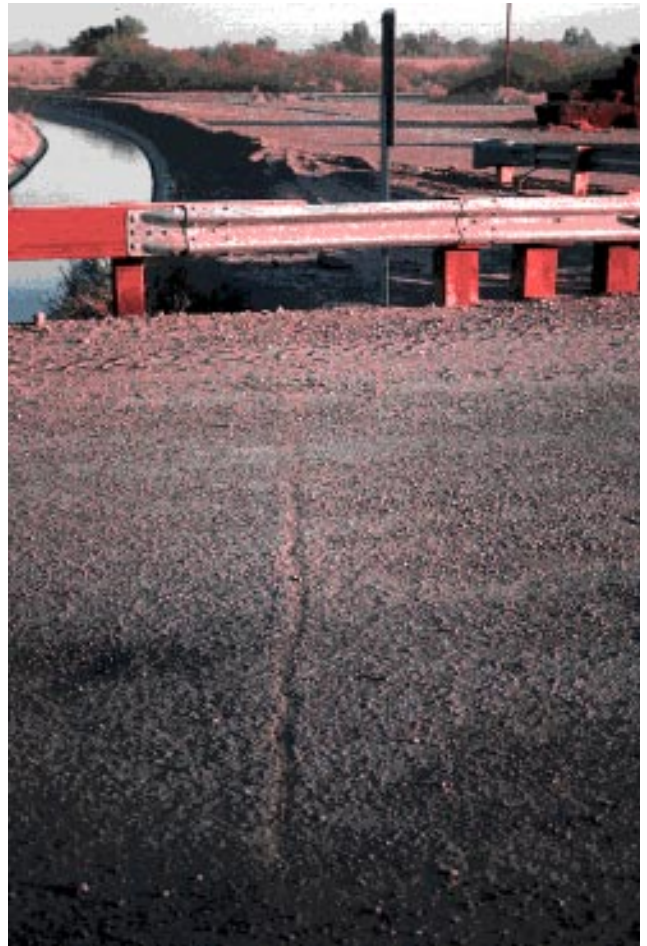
Crack in asphalt at end of bridge and approach road interface observed during condition assessment.
